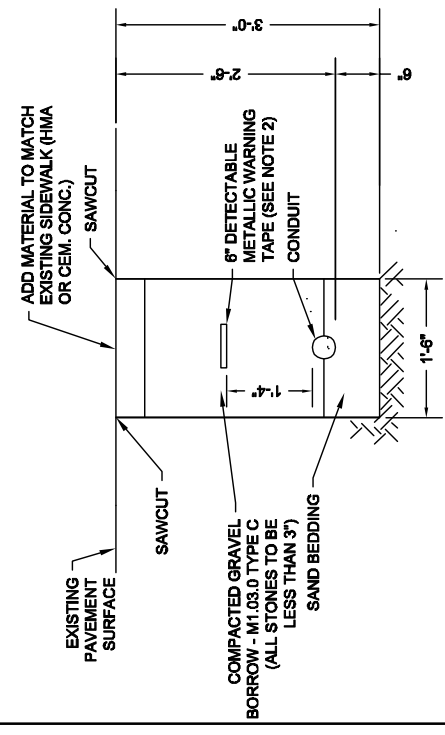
DETAIL FOR PIPE TRENCH IN MILLING AREAS
